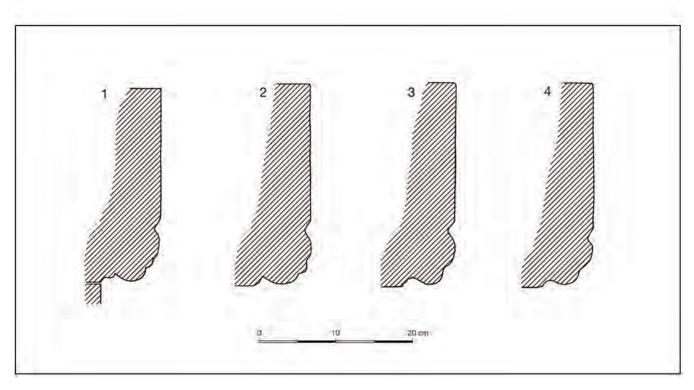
Tower: Stage 1A, doorways. Moulding profiles of the impost blocks. 1, north-east; 2, north-west; 3, south-east; 4, south-west. Scale 1:5. Drawing: Warwick Rodwell
